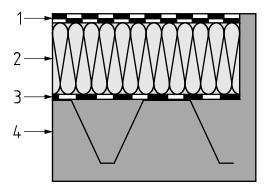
Position of joints. Left hand side: joint in the first (lower) layer of a double-layer roof waterproofing system. Right hand side: joints both in the upper layer of a double layer roof waterproofing system and in a single-layer waterproofing system
